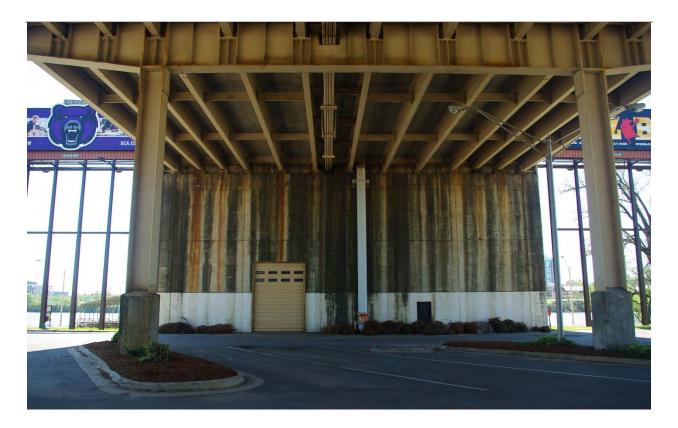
ARKANSAS RIVER TRAIL UNDER I-30 BRIDGE
